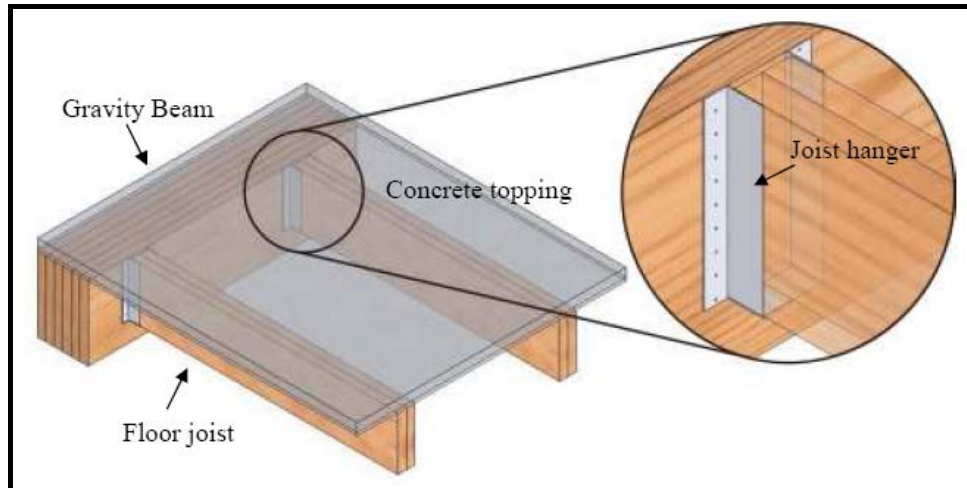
Typical Joist to Beam Connection (Smith, 2008b)
